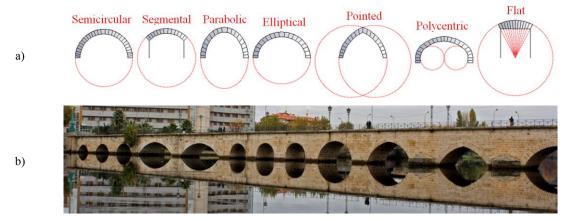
Masonry arches: a - Types of arches; b - Mirandela Bridge in Portugal
